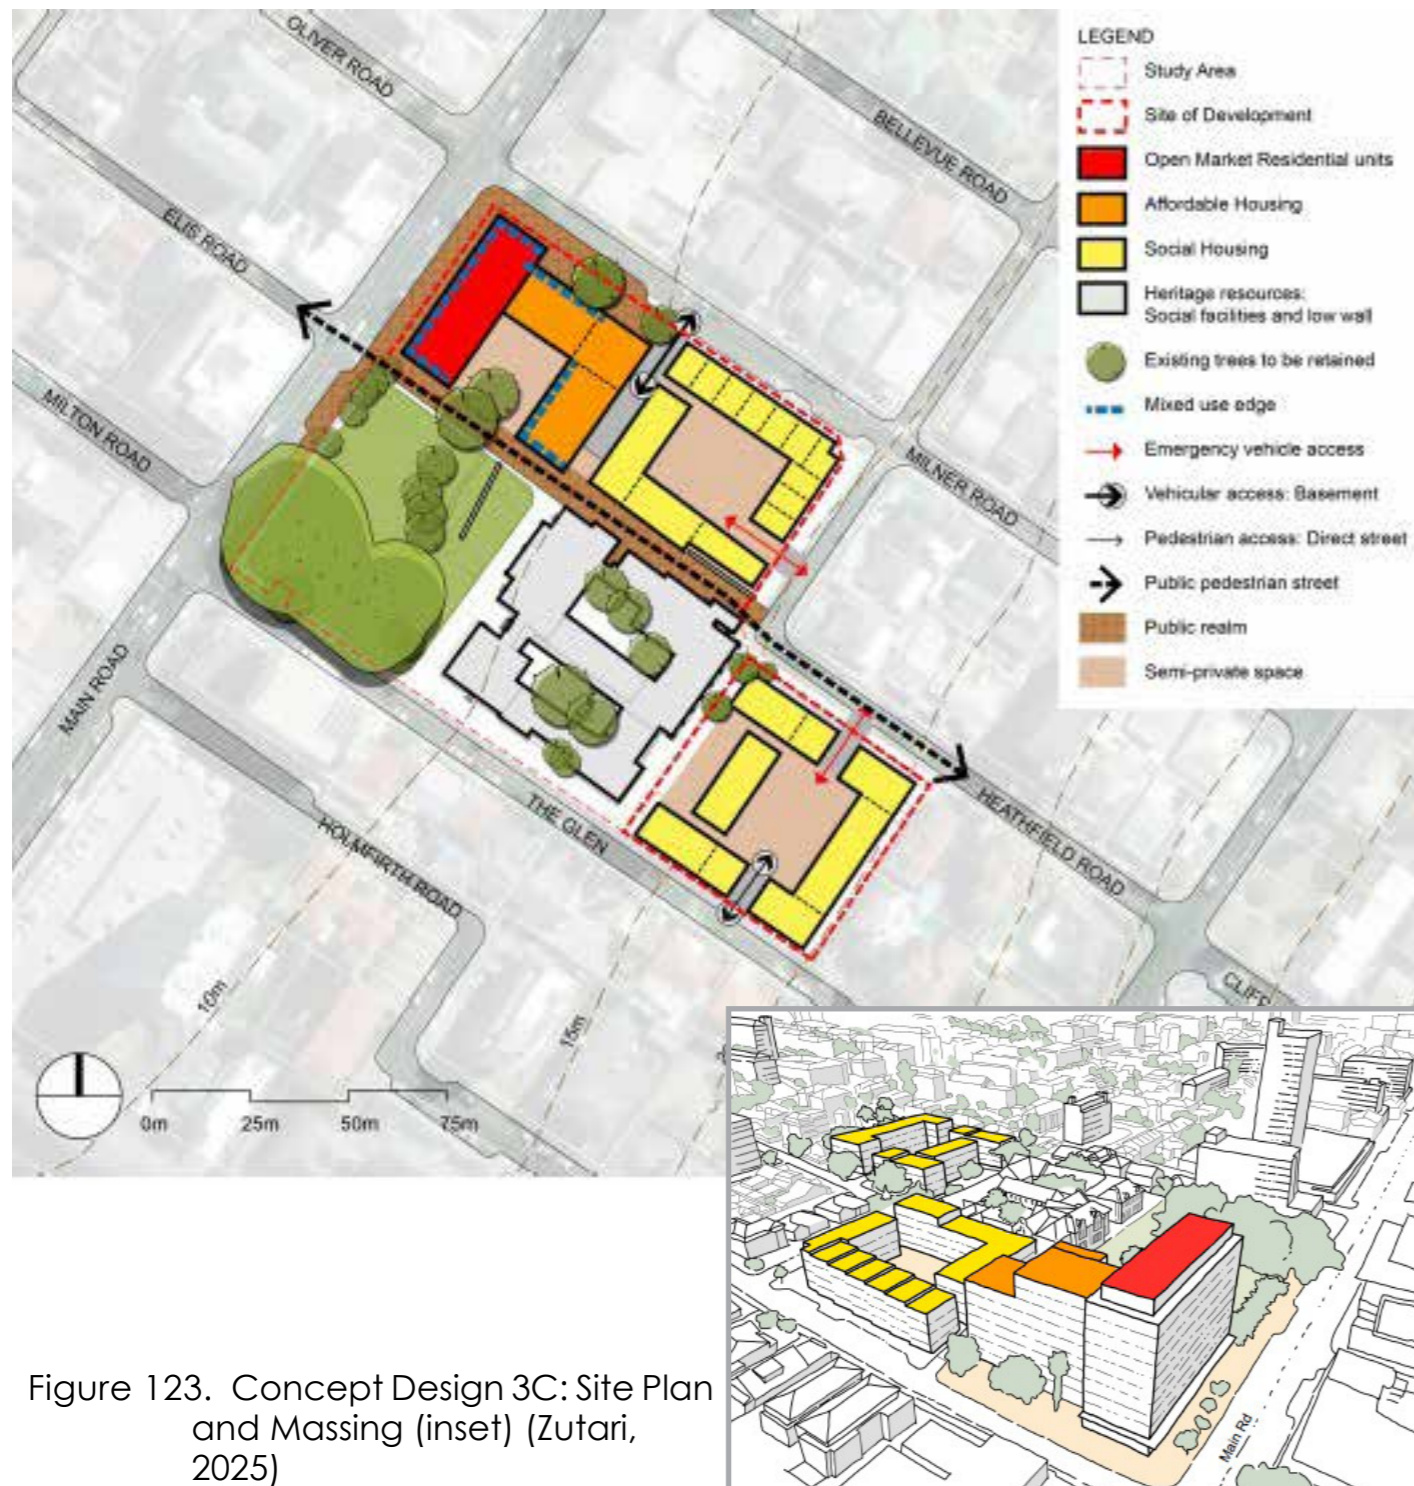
Concept Design 3C: Site Plan and Massing (inset) (Zutari, 2025)
